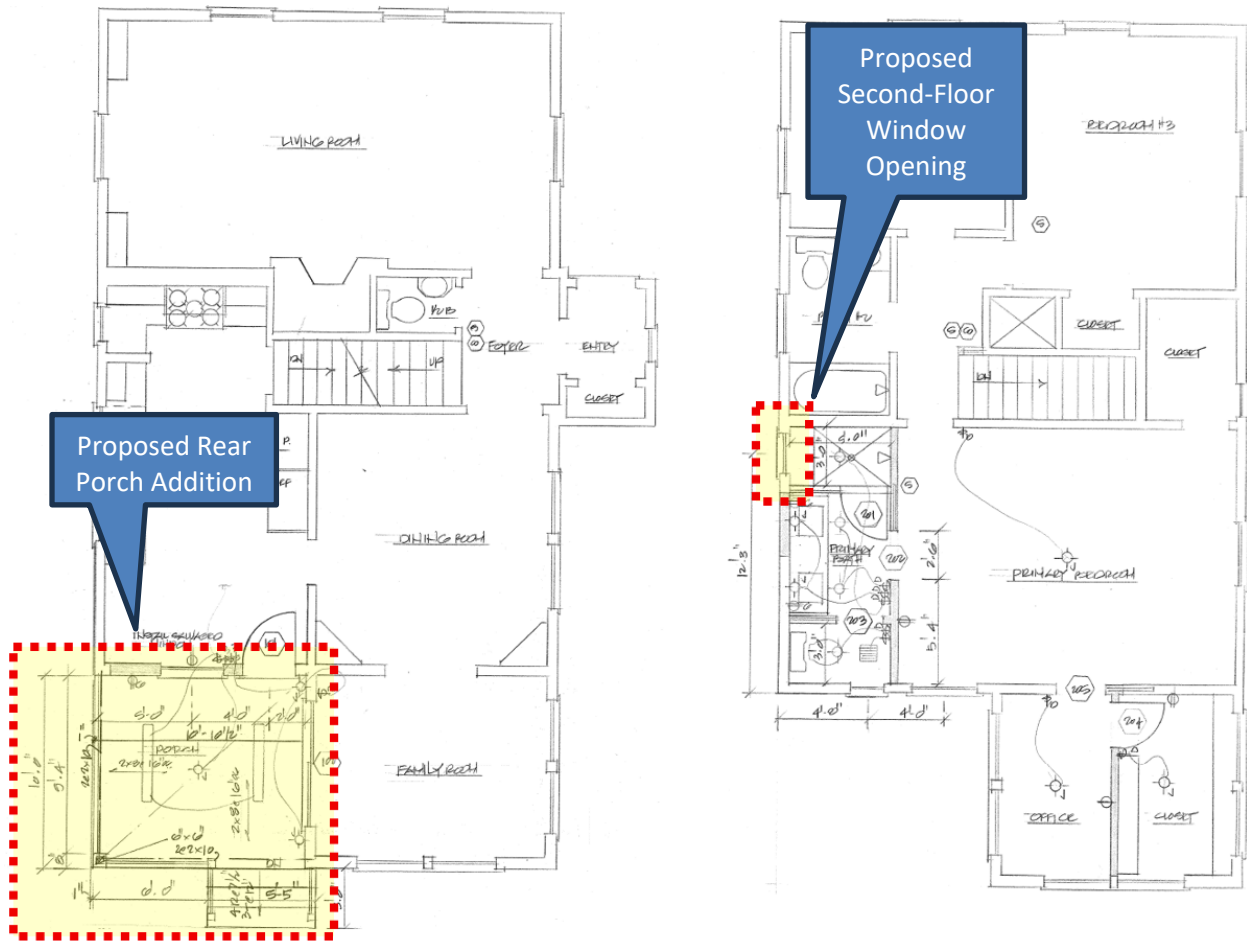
Proposed First-Floor Plan and Second-Floor Plan
